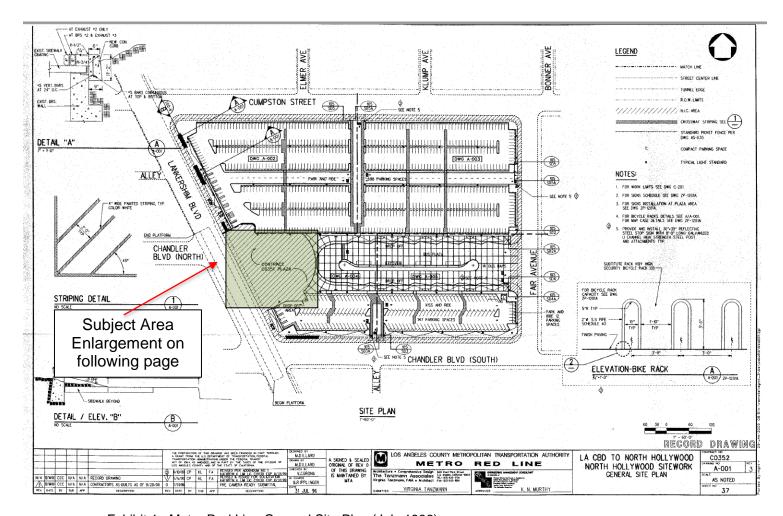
Metro Red Line General Site Plan (July 1996)
